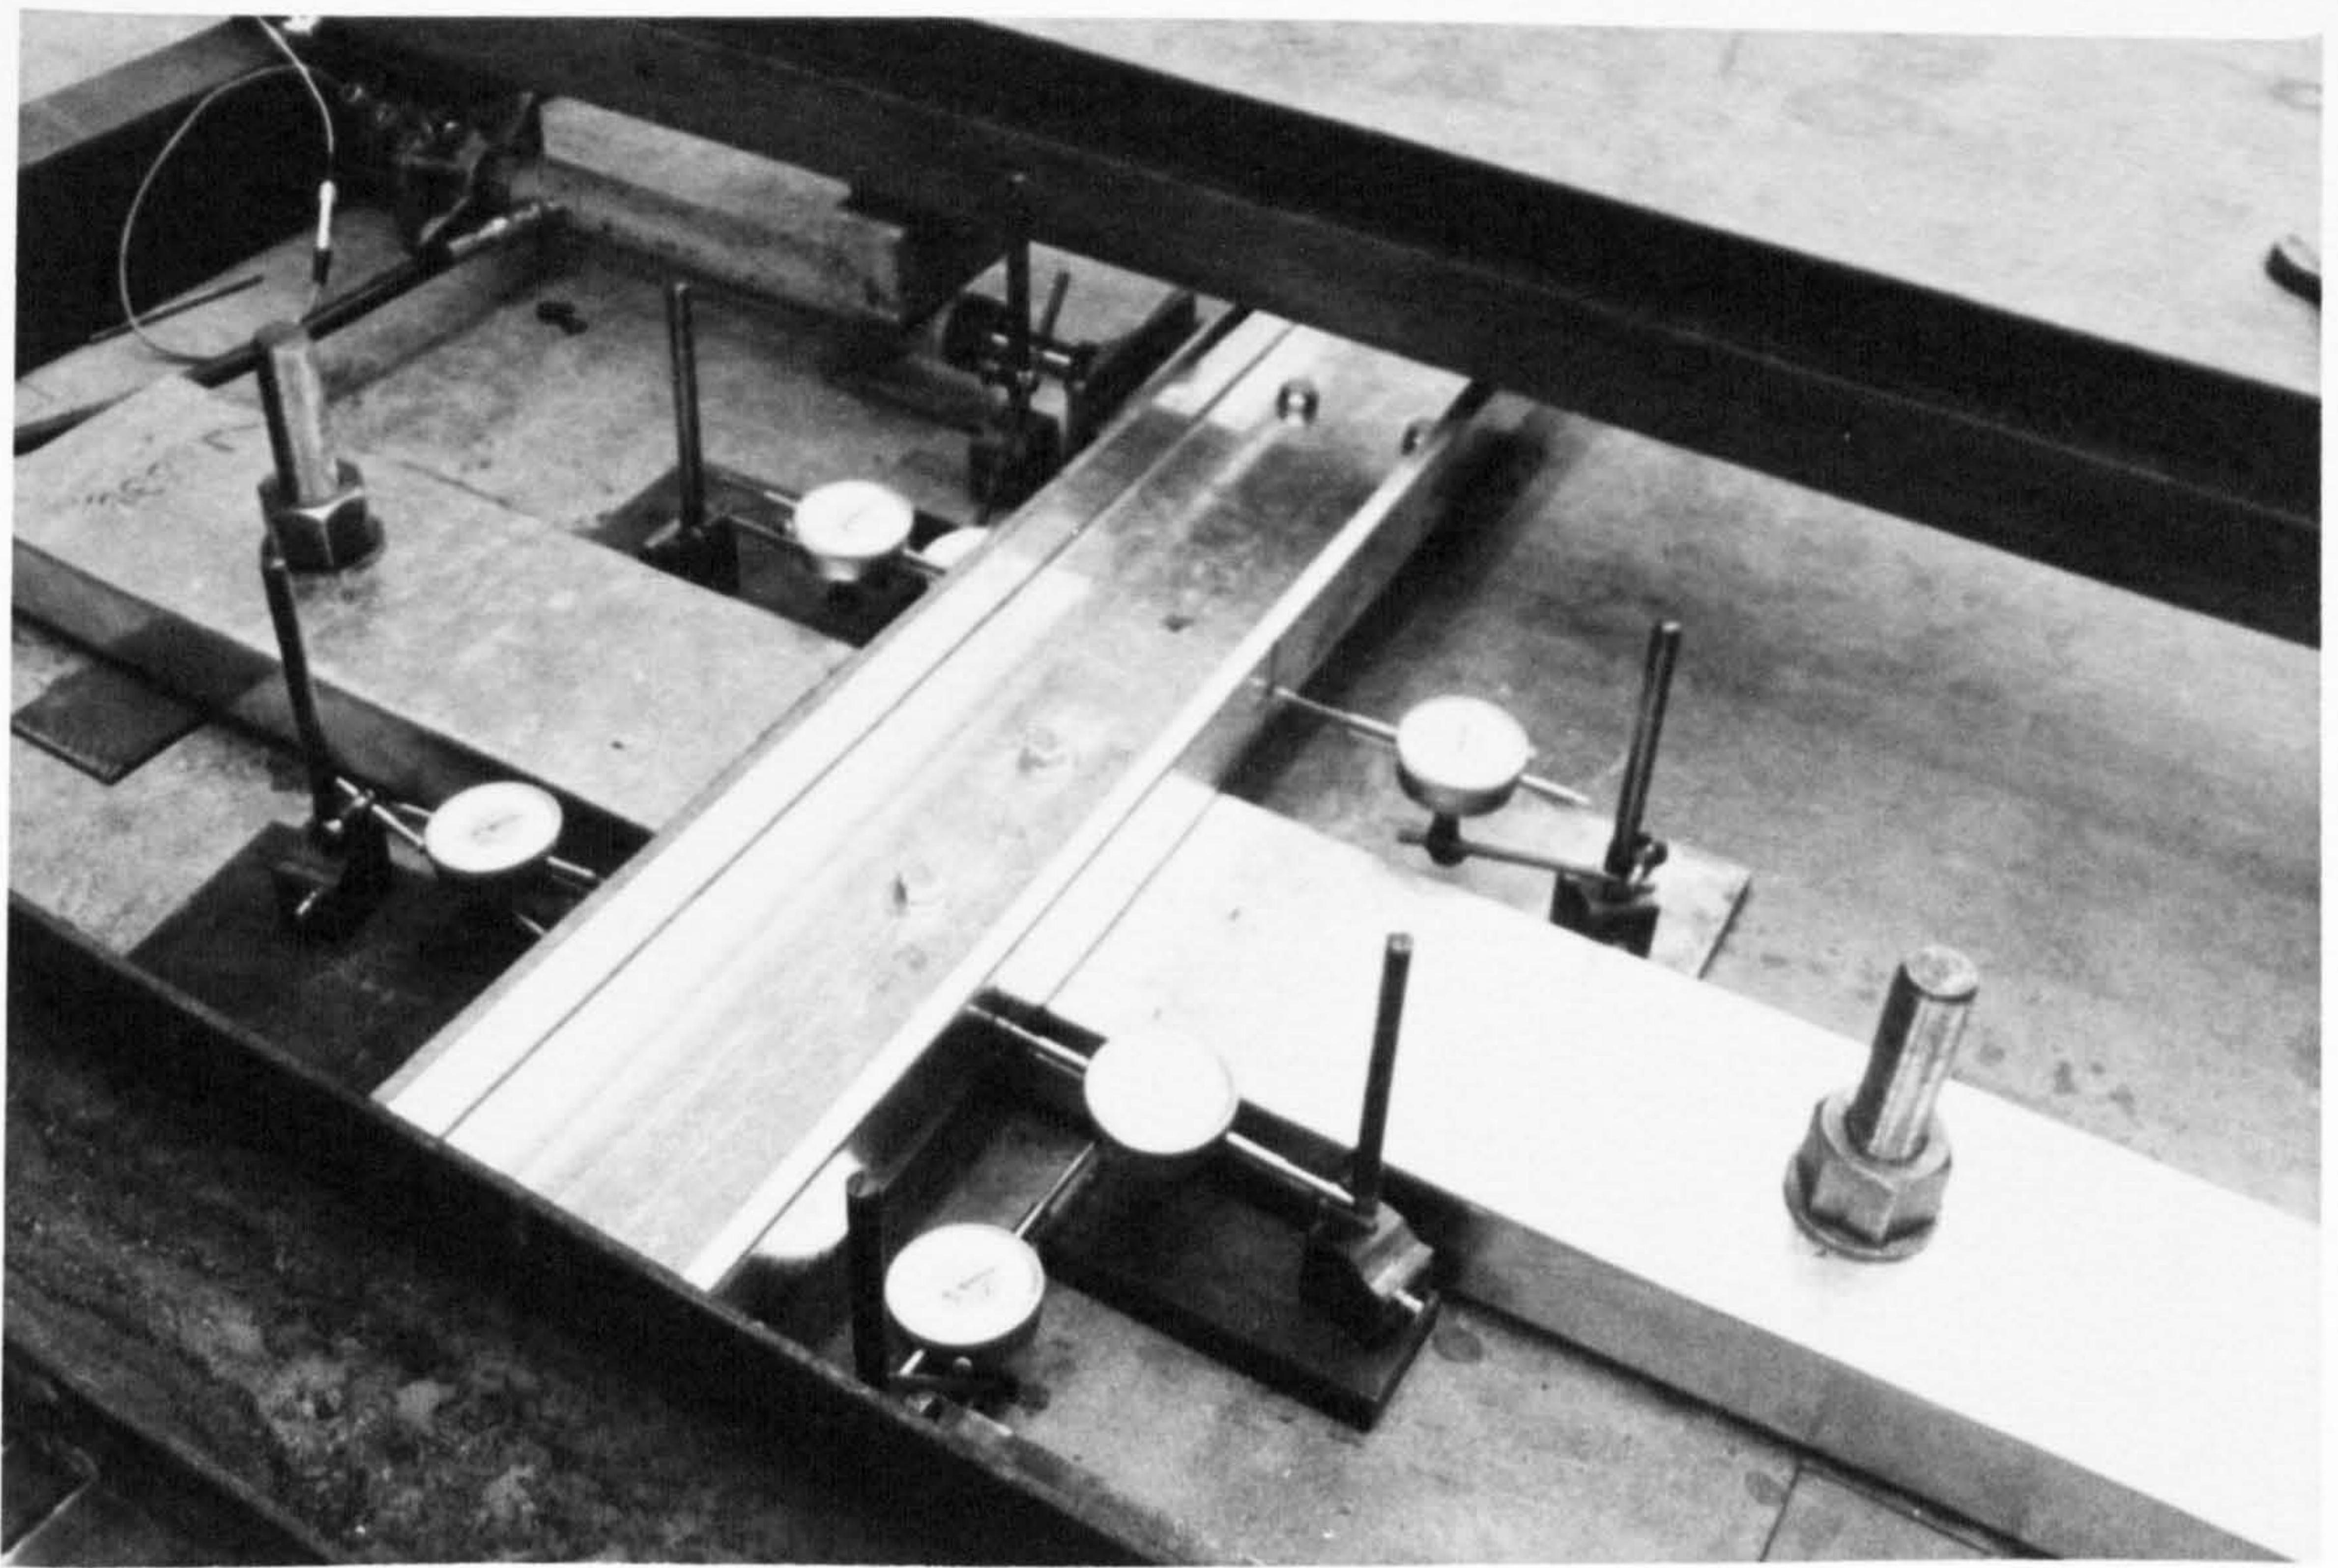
Two bolt connection in the floor set up, before and after failure
